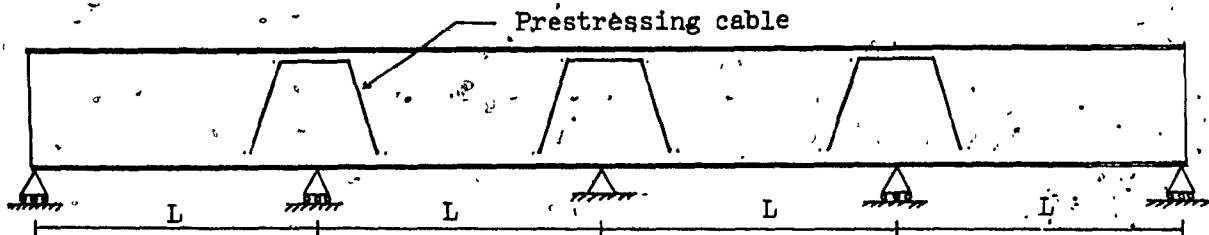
Prestressed Solution for a Multi-Span Girder Bridge Using Draped Segmental Cable.
